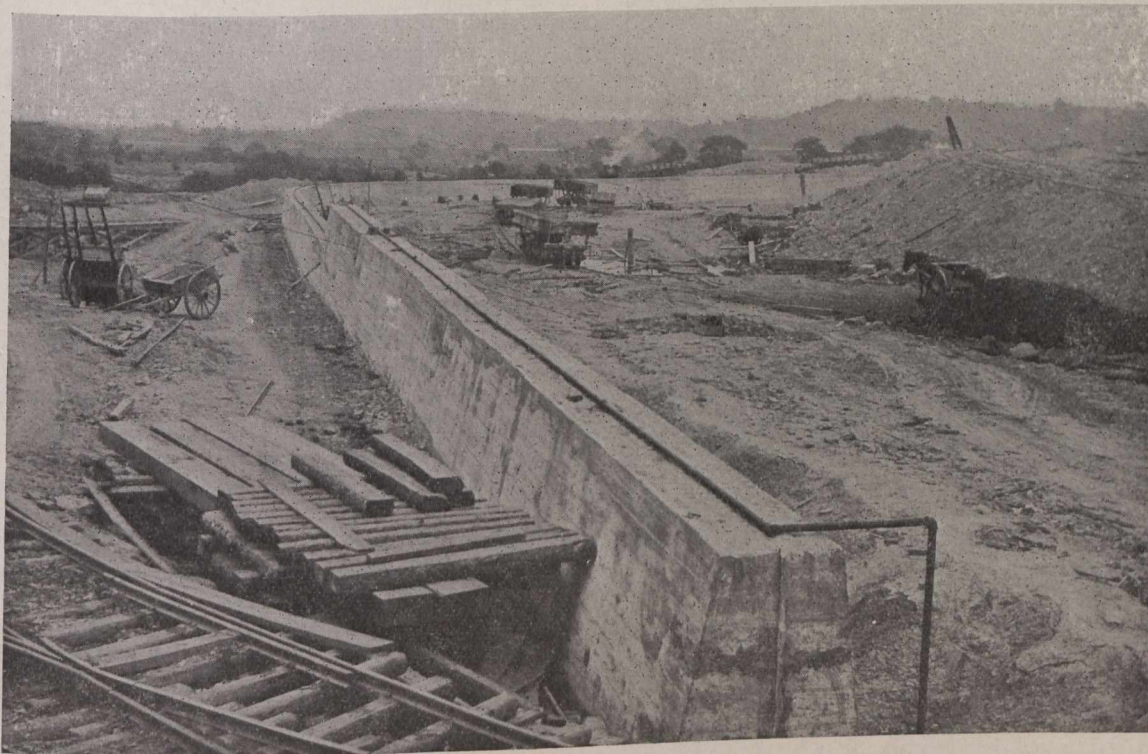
Core Wall of Dam at Head of Lock No. 6, Section 3.
